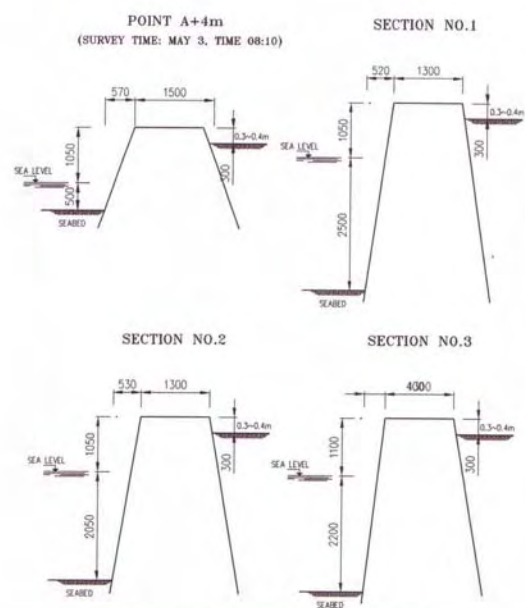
Existing Quaywall Sections (L-4 Fonadho)
